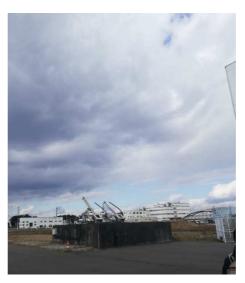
View of damaged parts of buildings and sections, at the Minami-Gamo Wastewater Treatment Plant, after the tsunami
